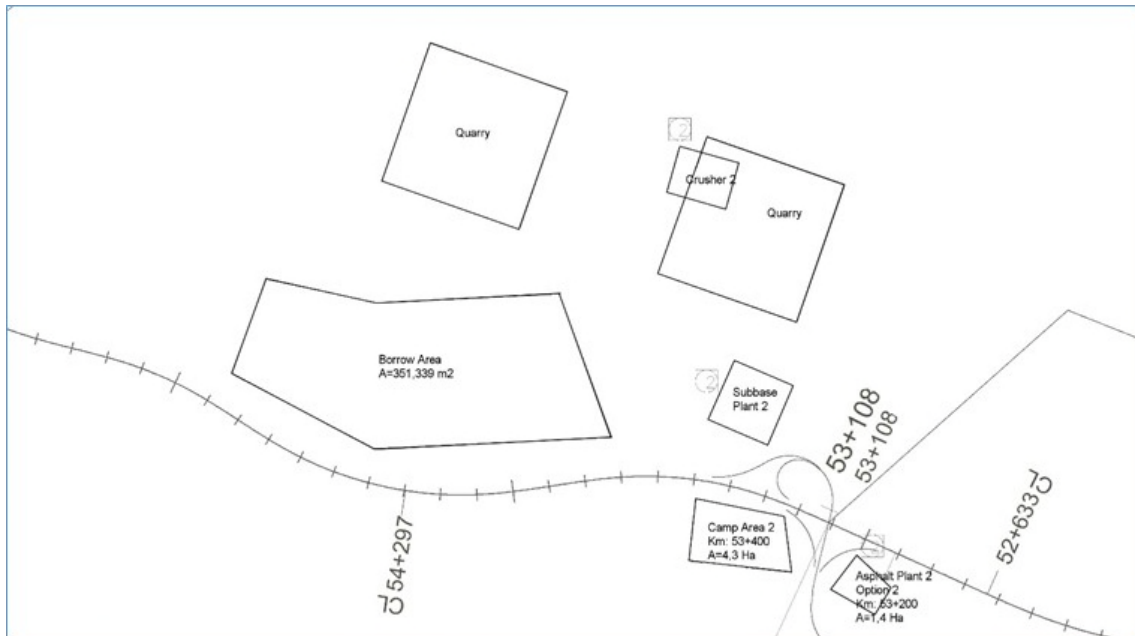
Asphalt Plant-2 and Subbase Plant-2
